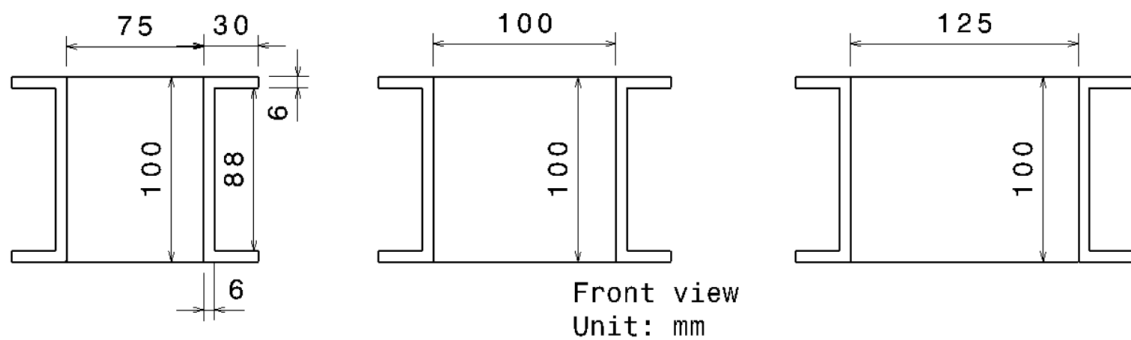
Group 1 - GFRP C-section & Concrete Beam
